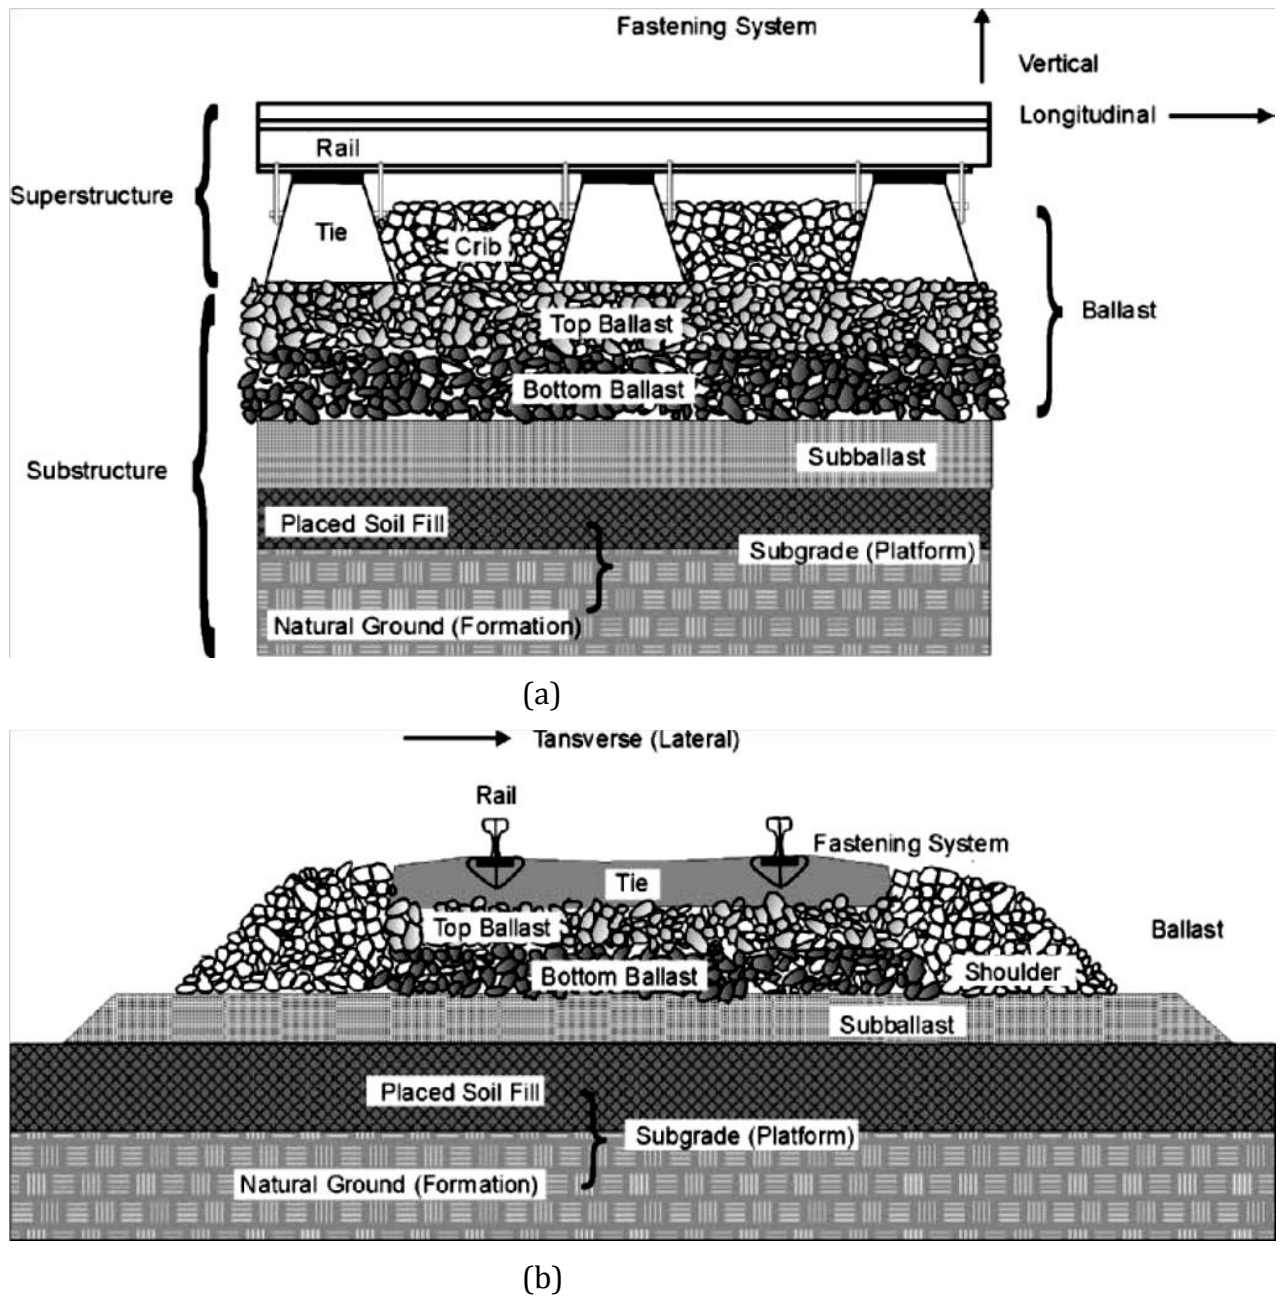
Components of track structure (a) longitudinal section; (b) transverse section (Selig, 2004)
